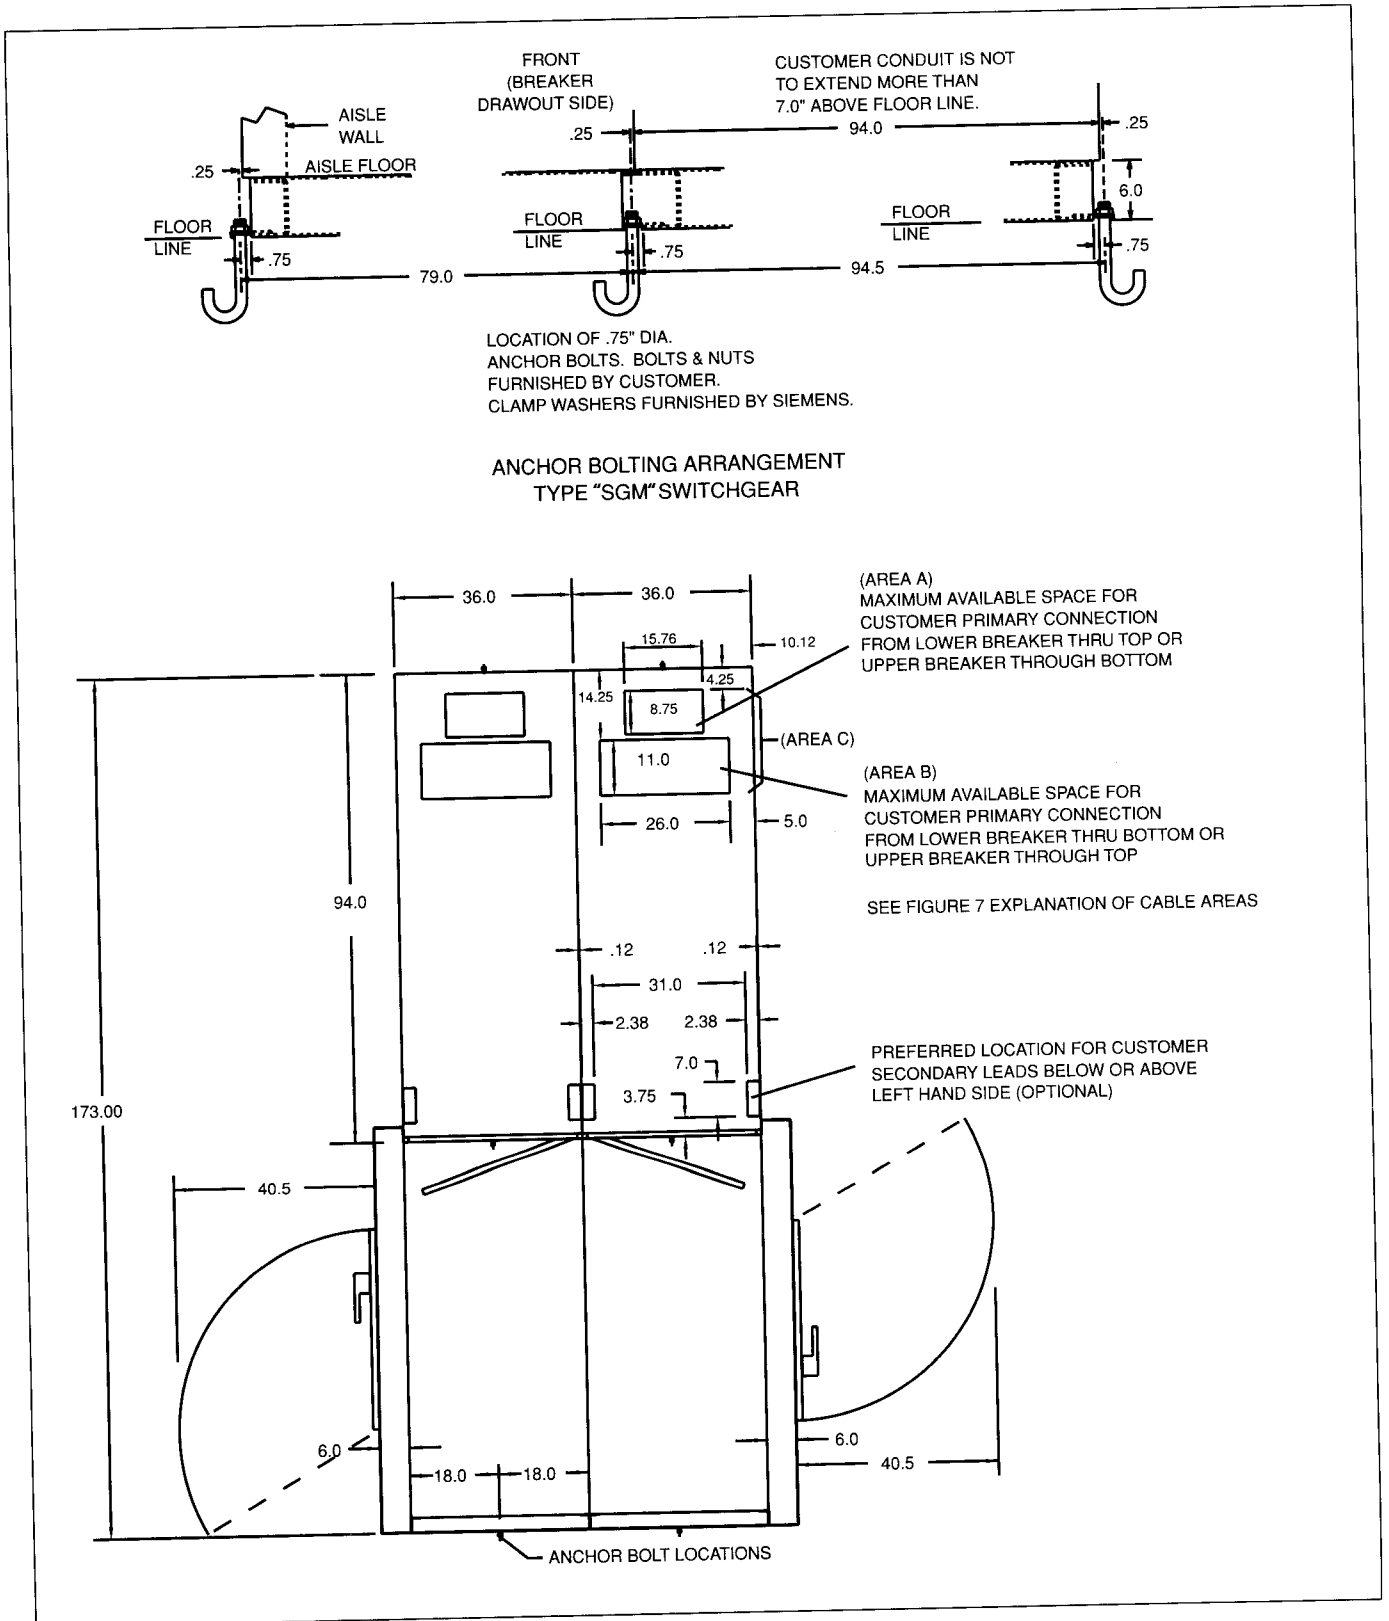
Anchoring Outdoor SGM Shelter-Clad (single aisle) Switchgear
